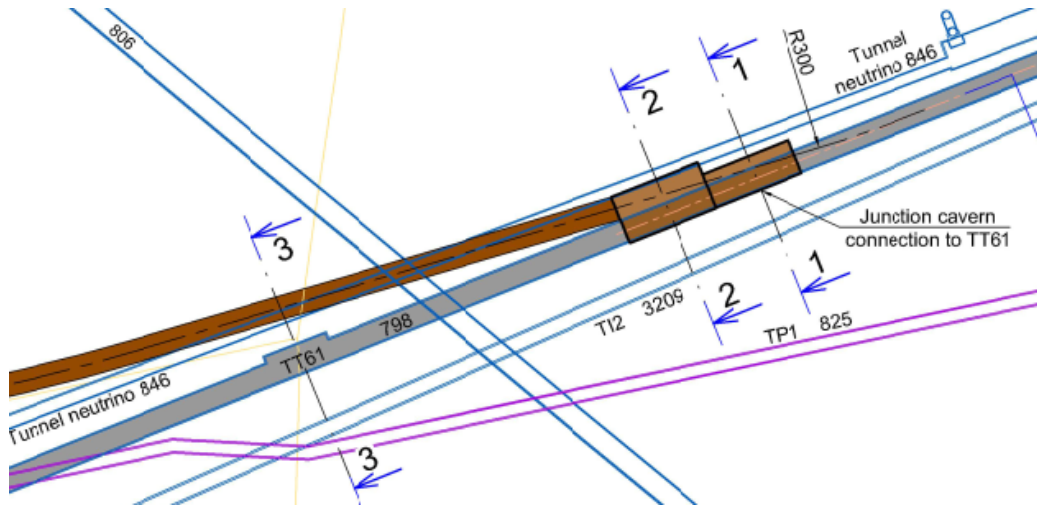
Plan view of required junction cavern connecting with the existing tunnel TT61.
